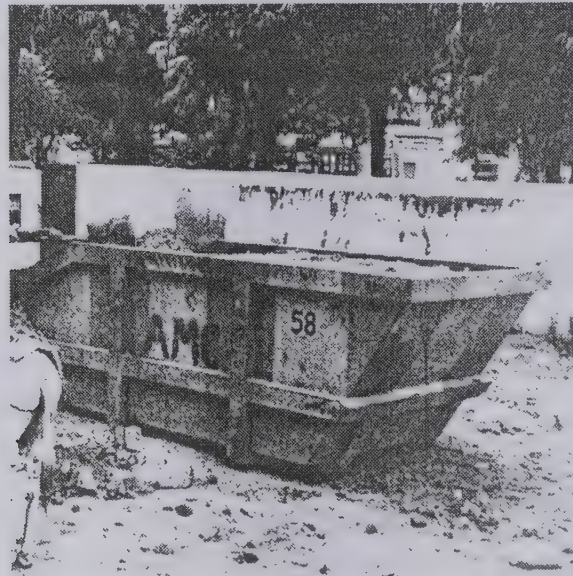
Open skip (container) kept for the storage of construction / demolition waste.
